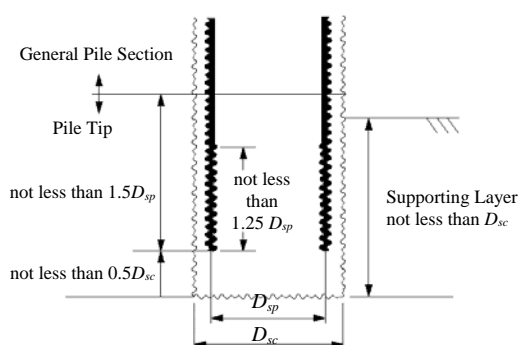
Pile Tip of Steel Pipe Soil Cement Pile
